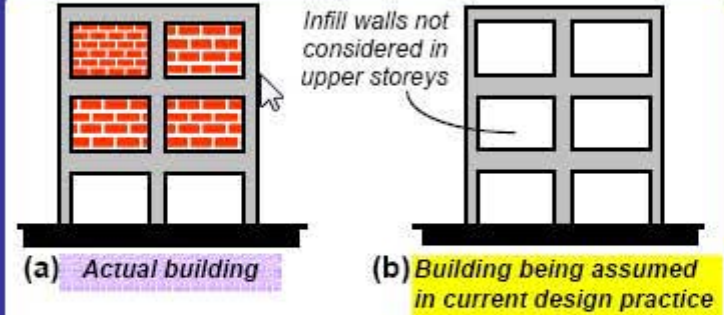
Open ground storey building – assumptions made in current design practice are not consistent with the actual structure.
